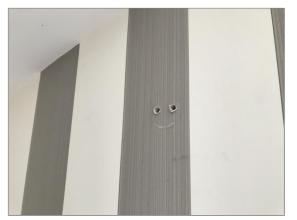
Mechanical damage to rear second floor bedroom walls
